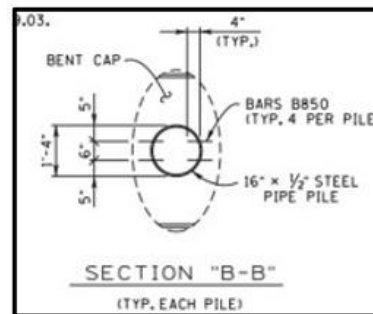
below illustrates an example of the details regarding the connection between the steel pipe pile and concrete bent cap at the Norfolk Southern Railroad Station.
